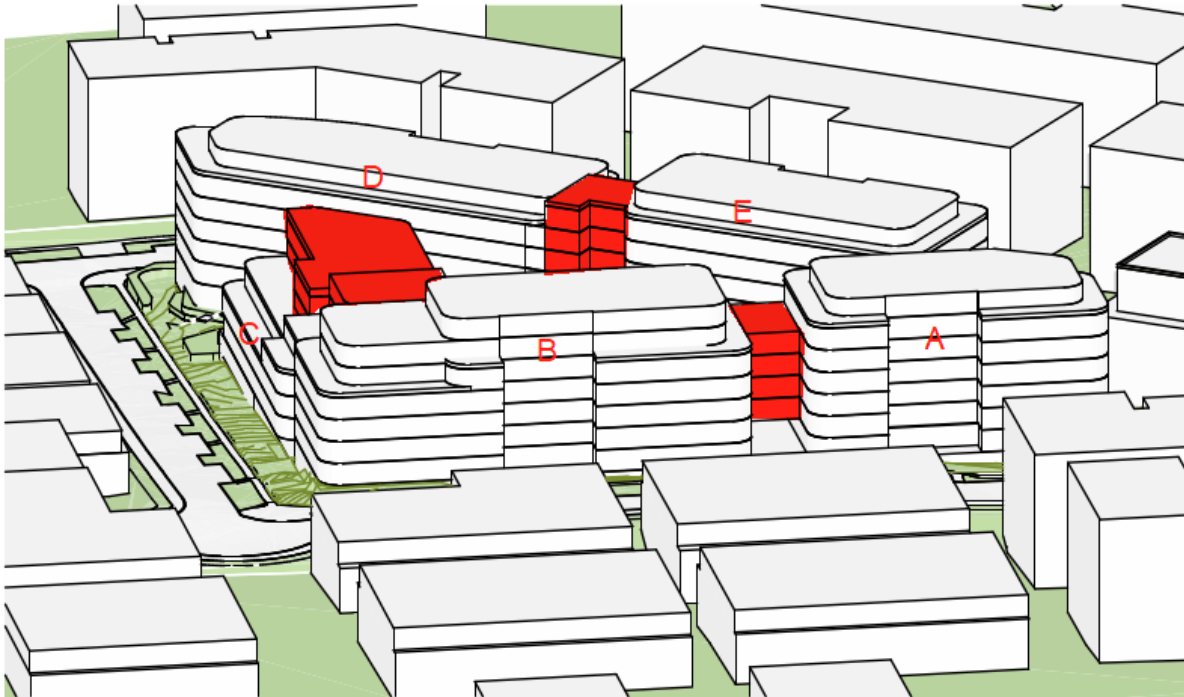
Additions (highlighted in red) proposed to originally approved Concept DA.
